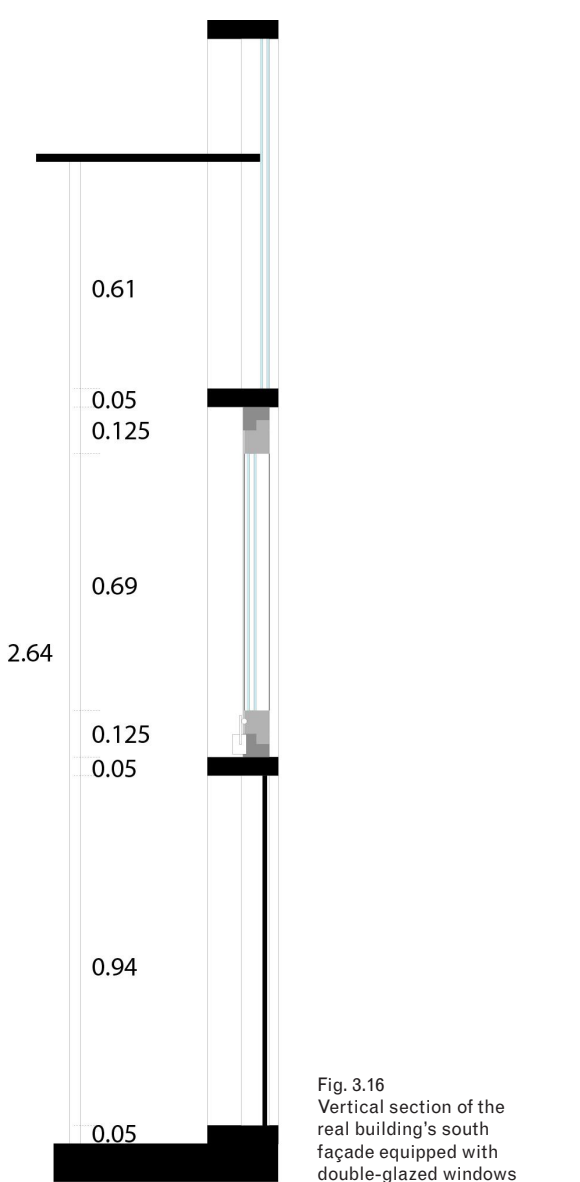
Vertical section of the real building's south façade equipped with double-glazed windows
